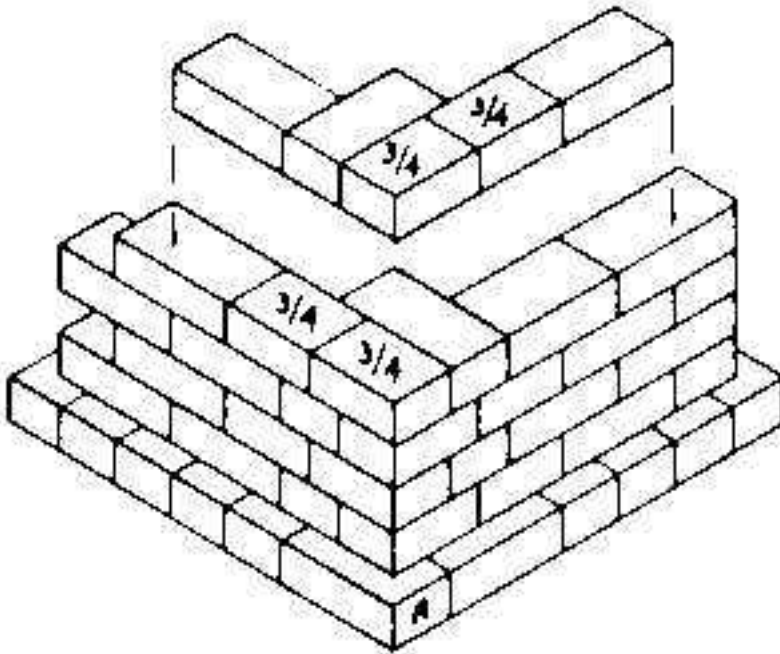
Critical Structural Details - Half Brick Wall Details
